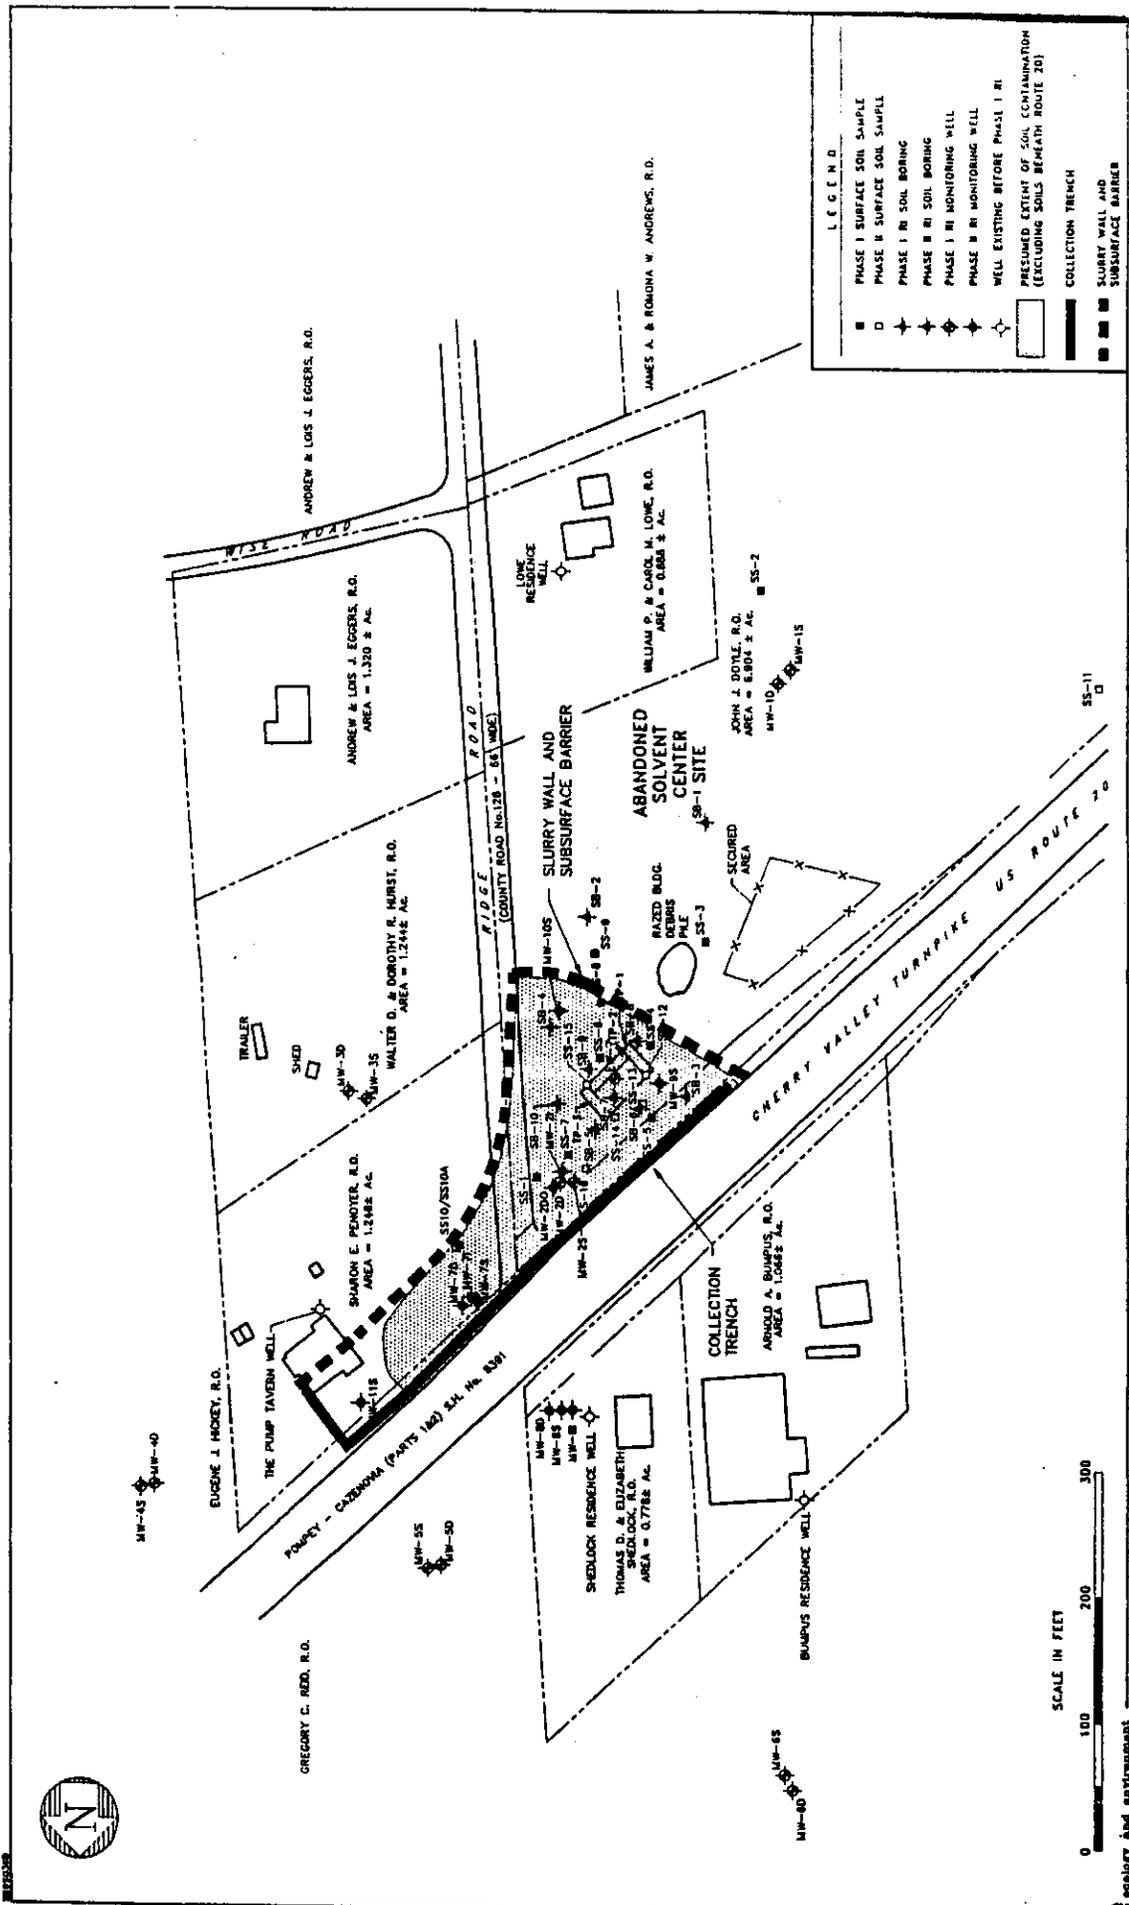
ABANDONED SOLVENT CENTER LOCATION OF SLURRY WALL AND COLLECTION TRENCH FOR GROUNDWATER ALTERNATIVE 3
